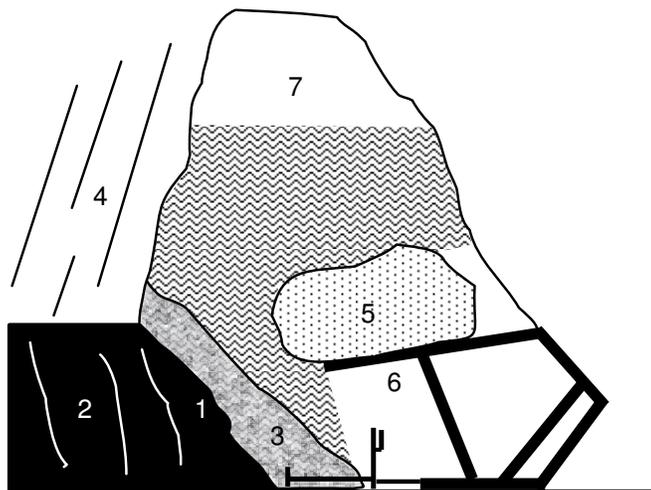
Schematic illustration of the impact of cavity fill in and around a major longwall roof fall
